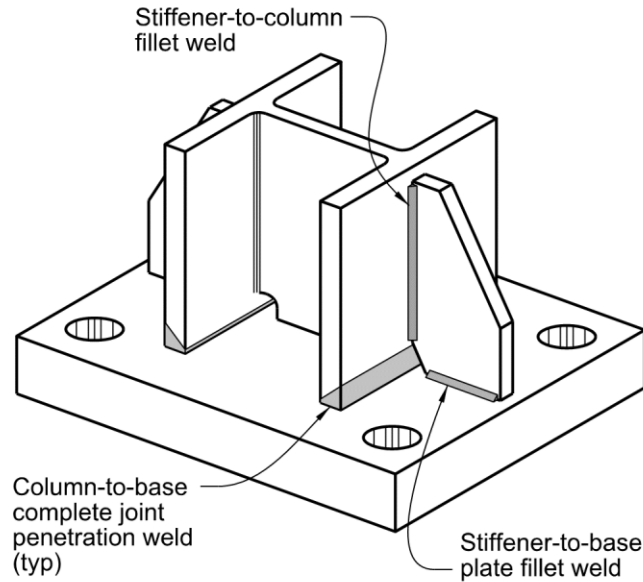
Intersection of column-to-base plate complete joint penetration groove welds with stiffener-to-base plate fillet welds and stiffener-to-column fillet welds.
